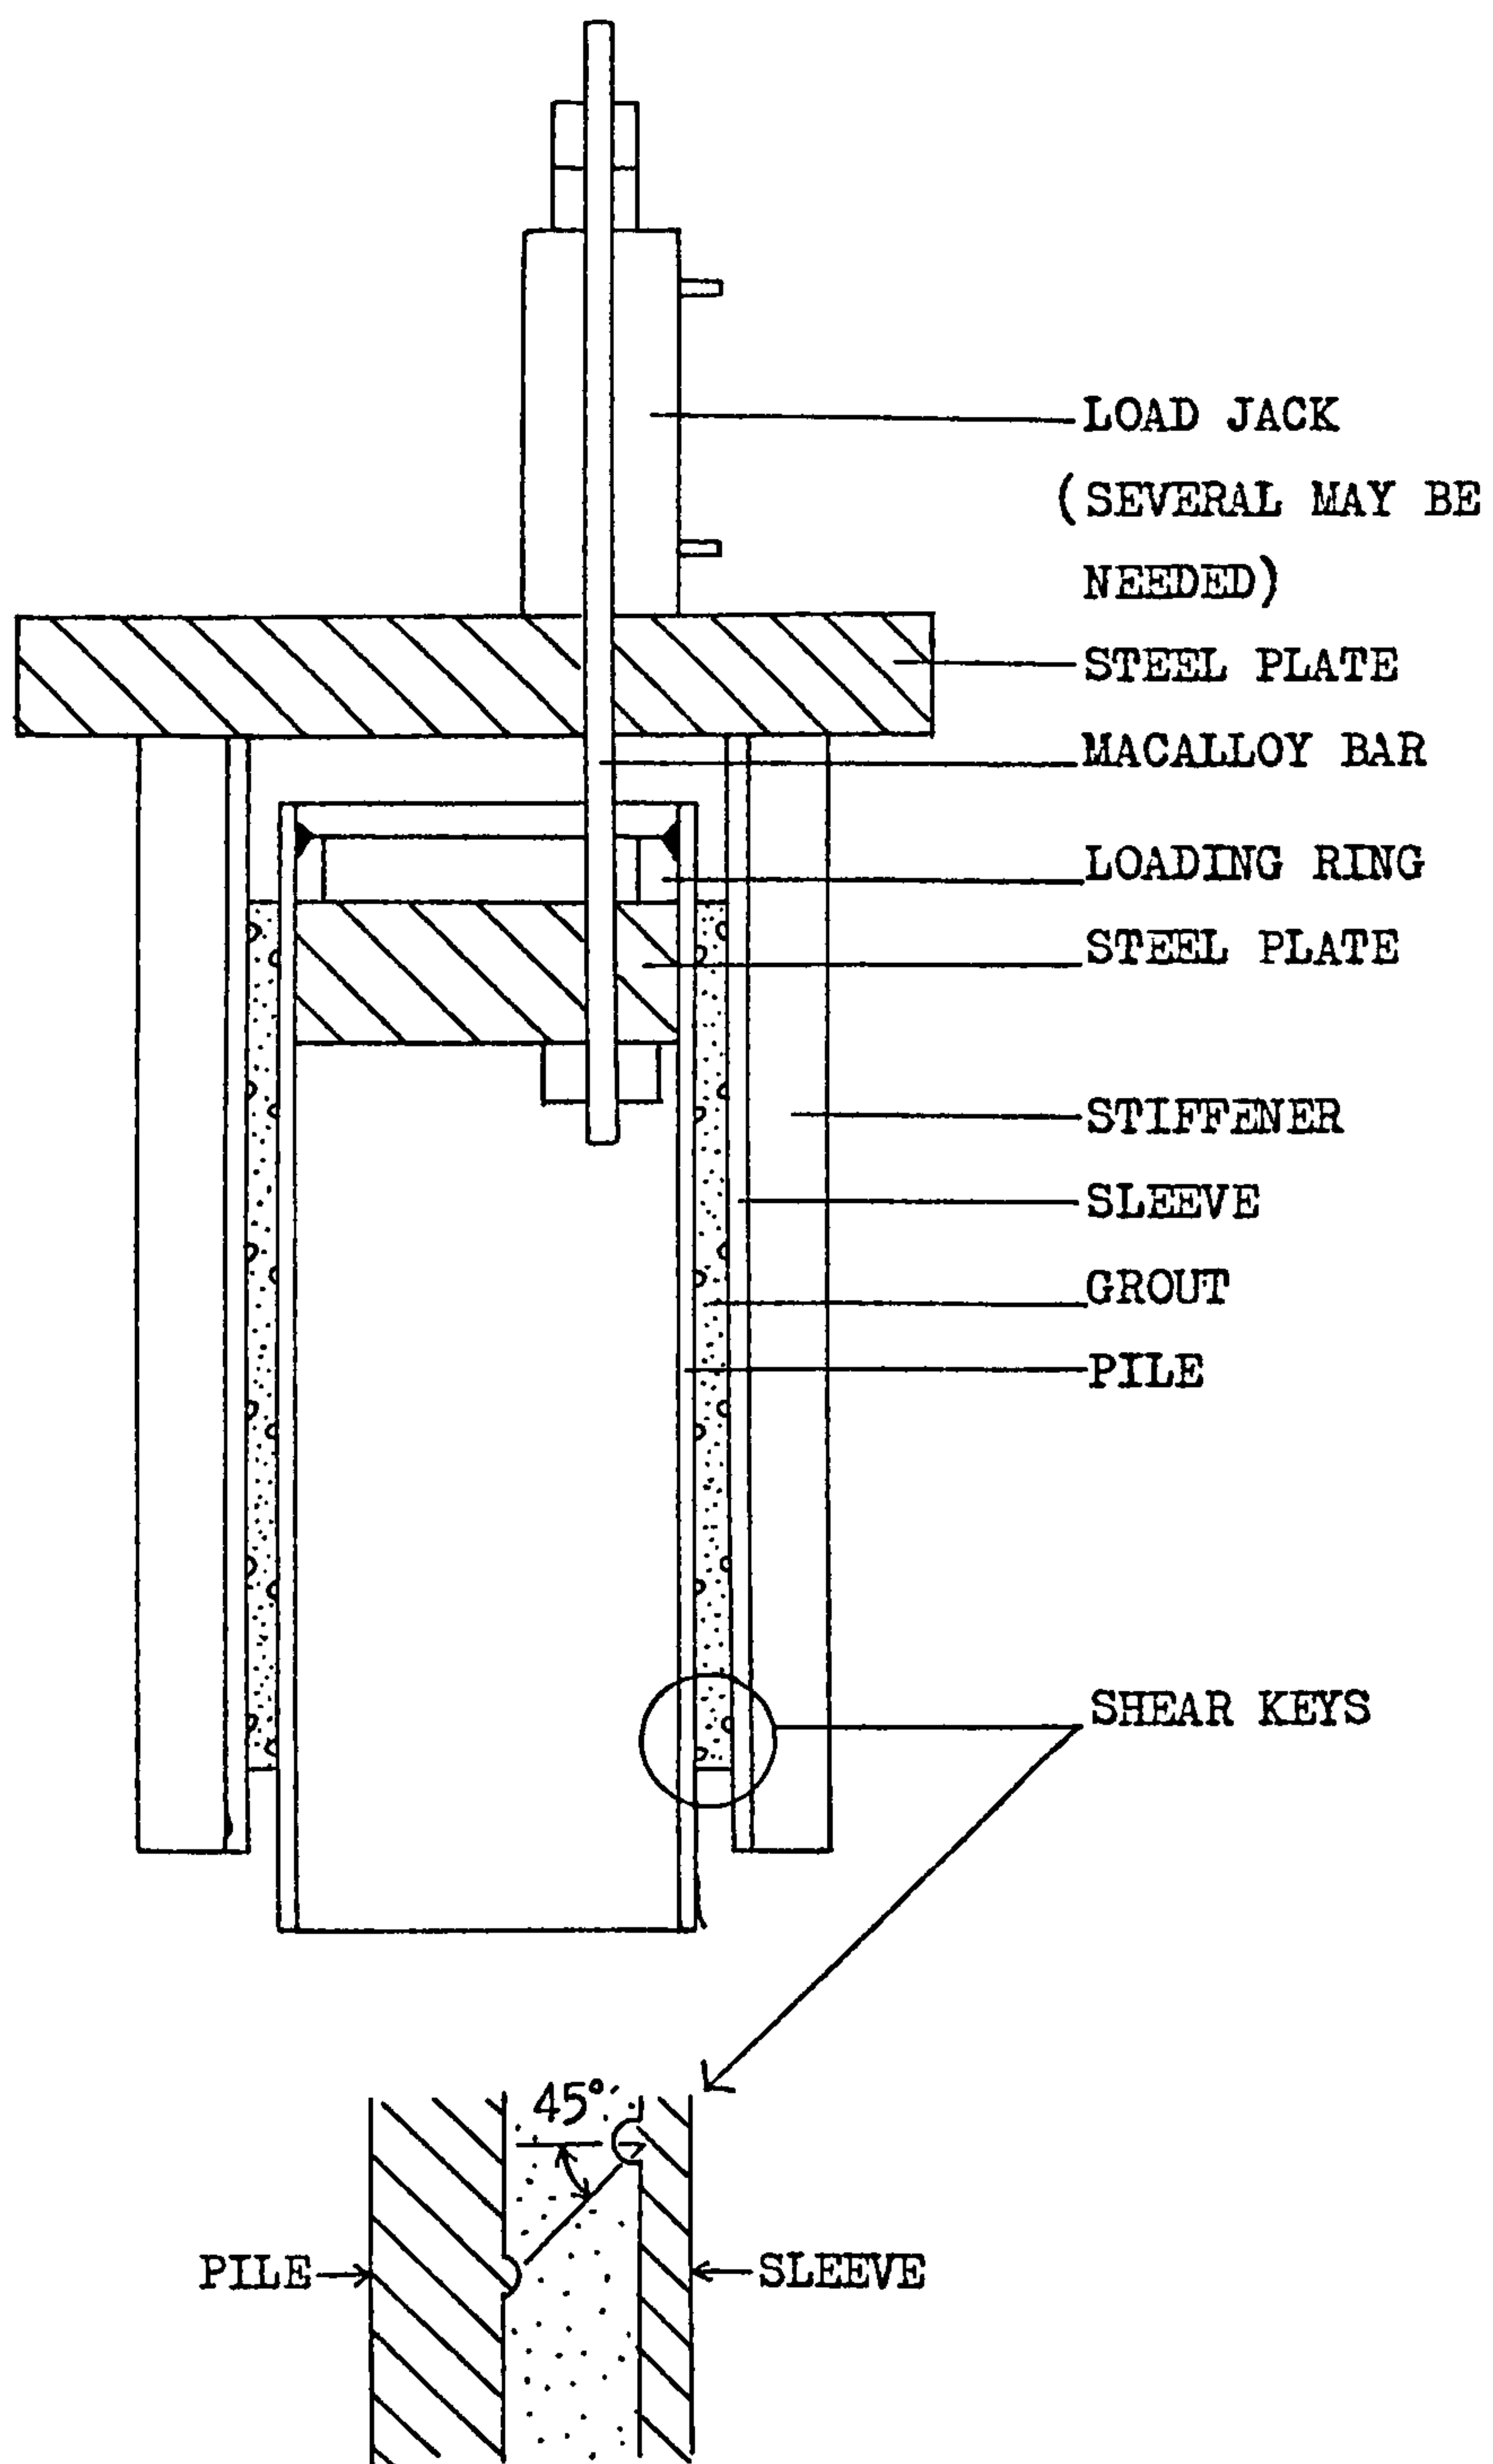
TYPICAL LOADING ARRANGEMENT WITH THE PILE IN TENSION AND SLEEVE IN COMPRESSION.
